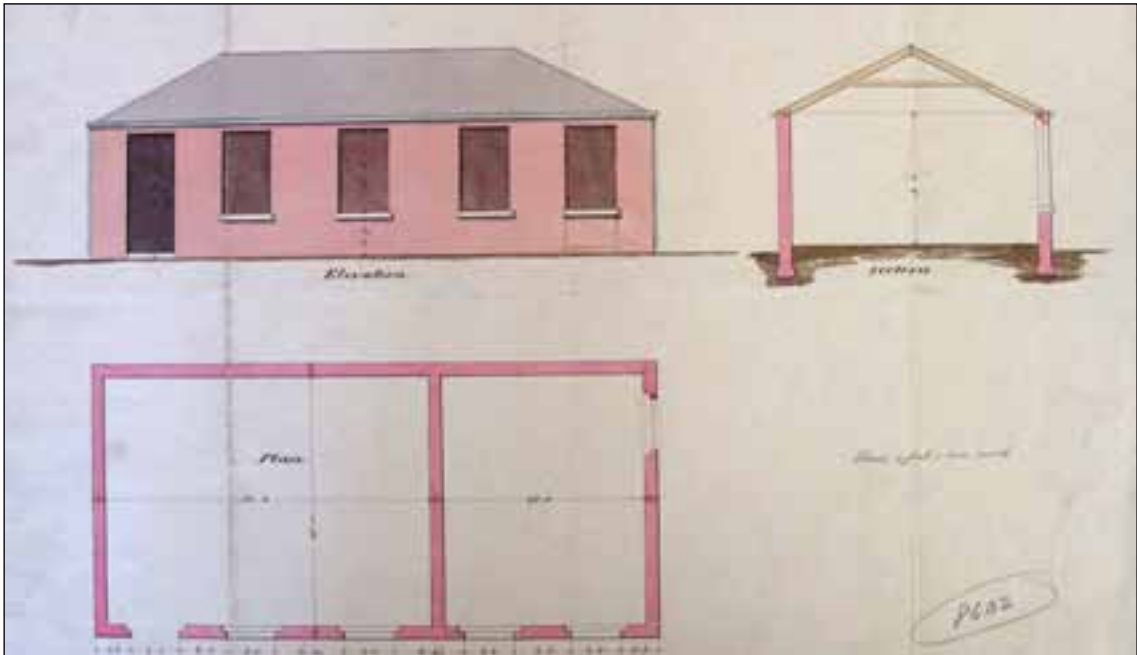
Plan for a storehouse, 1859 (EHA MD 95/6503)
